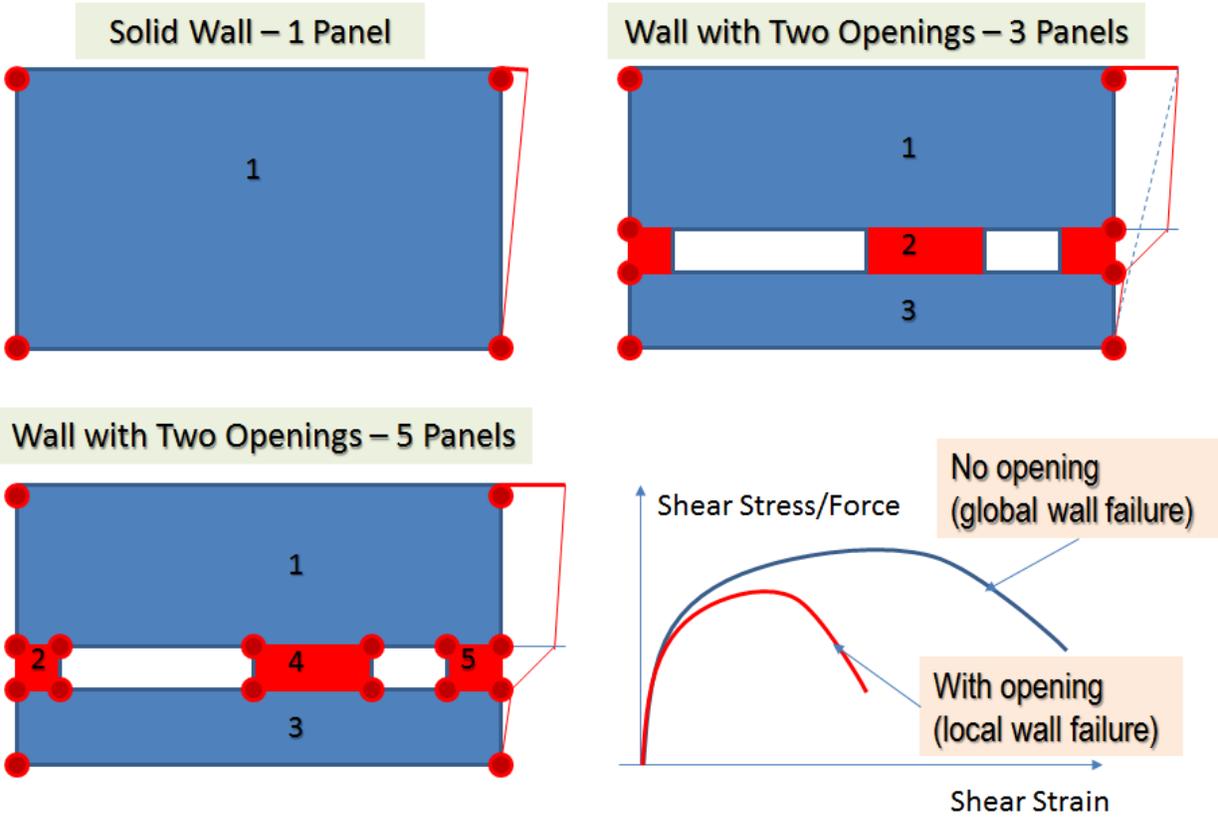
Subpanel Modeling for Concrete Wall with Large Openings
